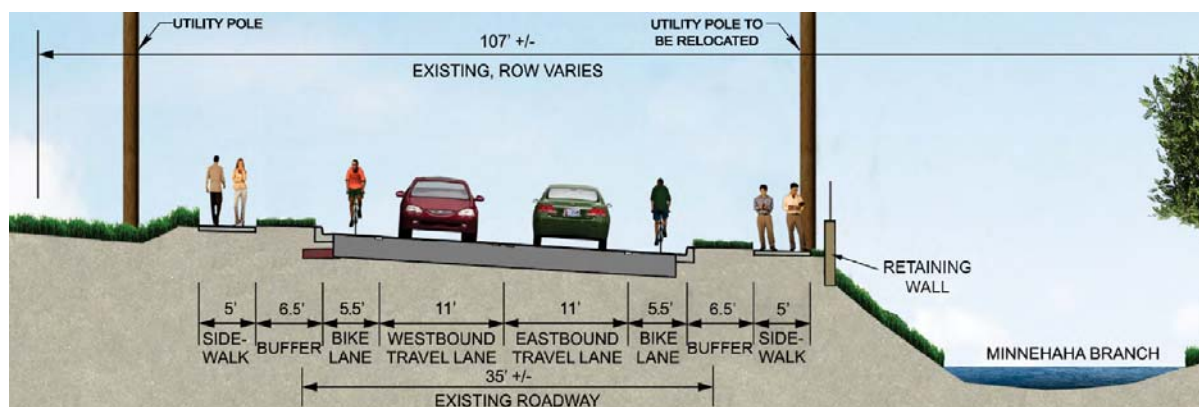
Typical Section - Alternative 1 - Sidewalk + Bike Lanes
